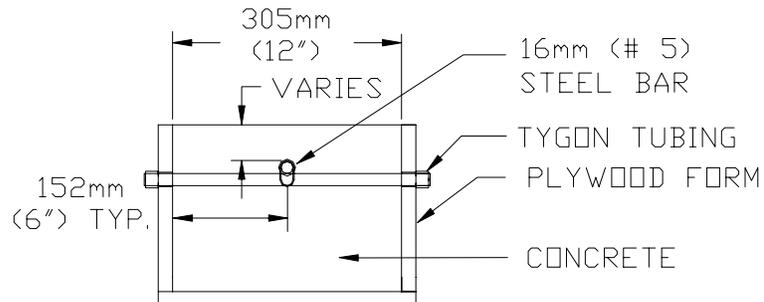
Form and Specimen Diagram for 305 mm (12 in.) Specimen Size
